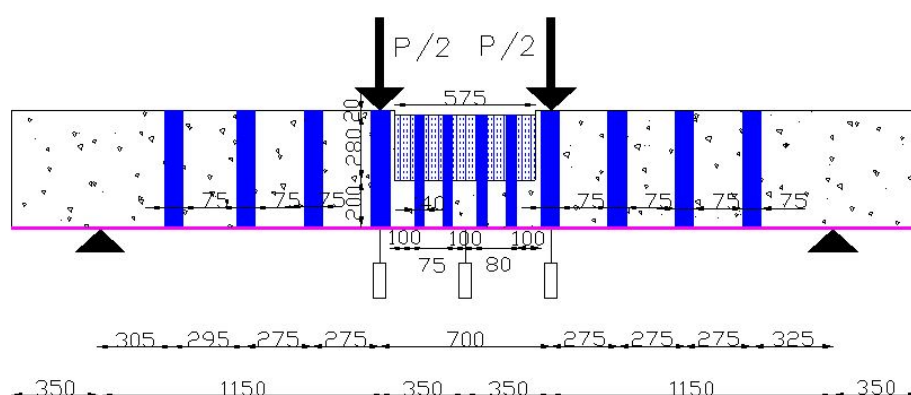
Specimen BEAM 1R-2 with CFRP layers attached in a way as to contain the compressive zone of the middle part as well as additional GFRP layer at the bottom side of the specimen extending the whole span.
